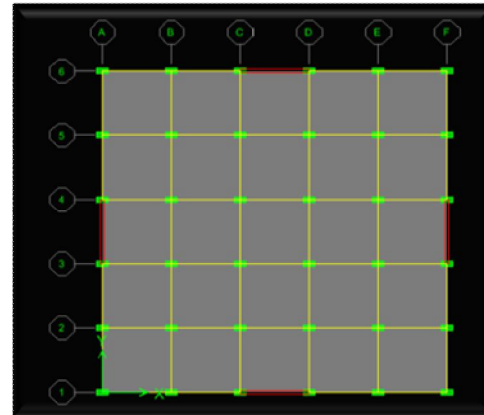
Plan of (G+7) Storey RCC Building with Dual System
